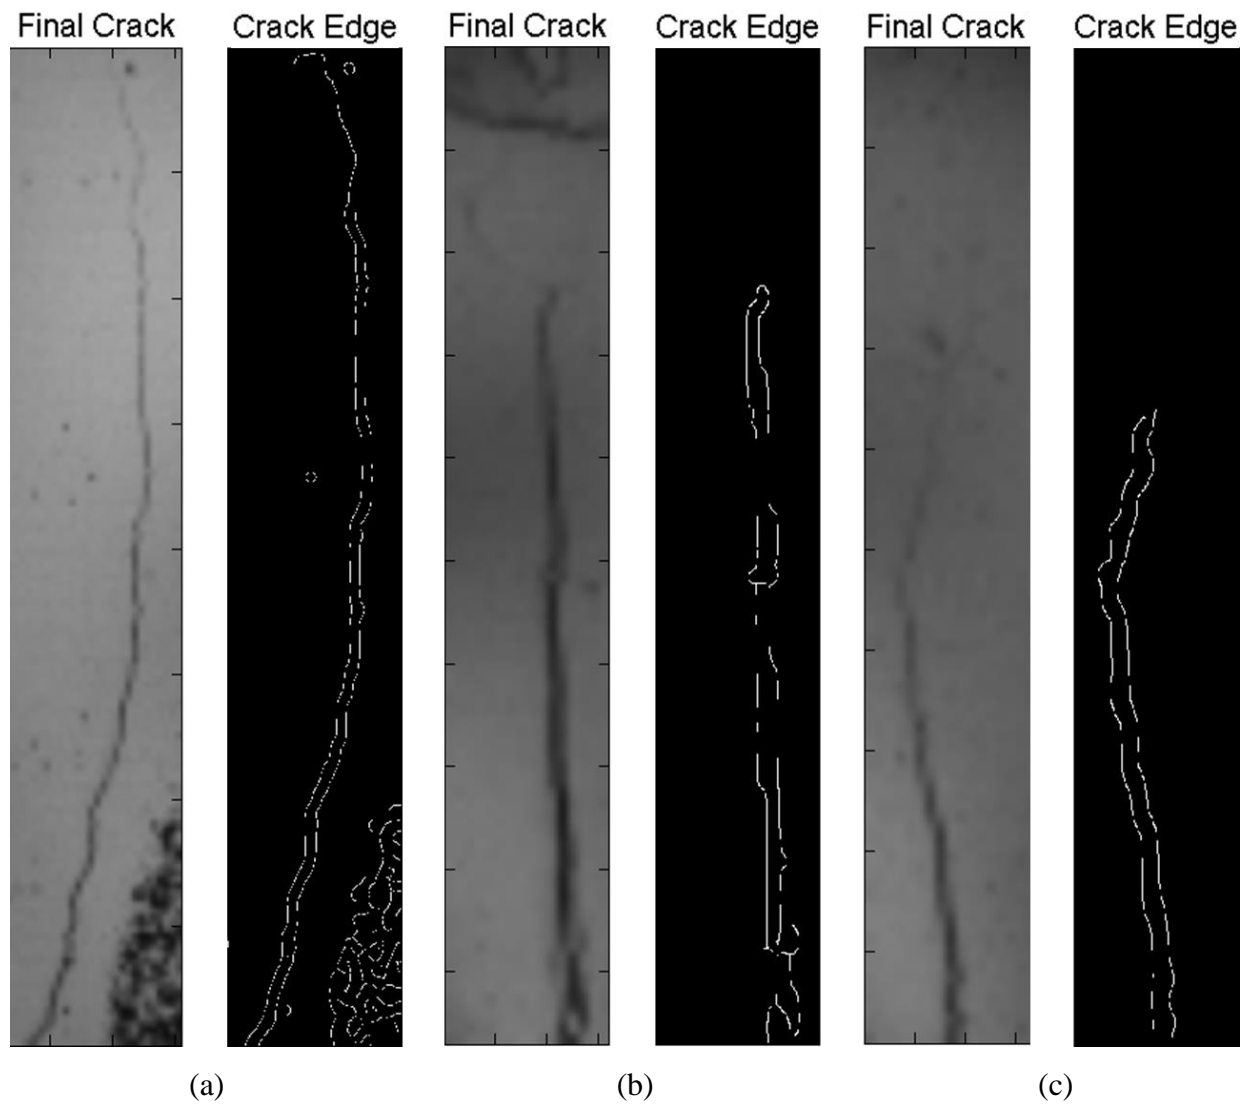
Examples of the final crack stage in captured and calculated images for CS-0.5% specimens under various loading speed: (a) 7.6 mm/sec (using the MTS machine); (b) Type 1 coupler (using M-SEFIM); (c) Type 2 coupler (using M-SEFIM)
